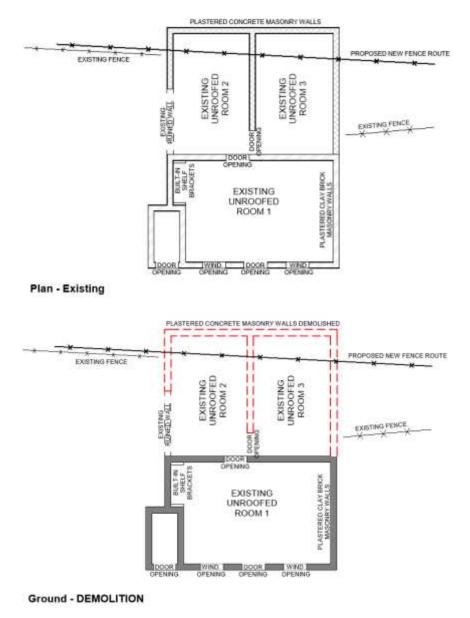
Existing Unroofed Ruin - Proposed Demolition
